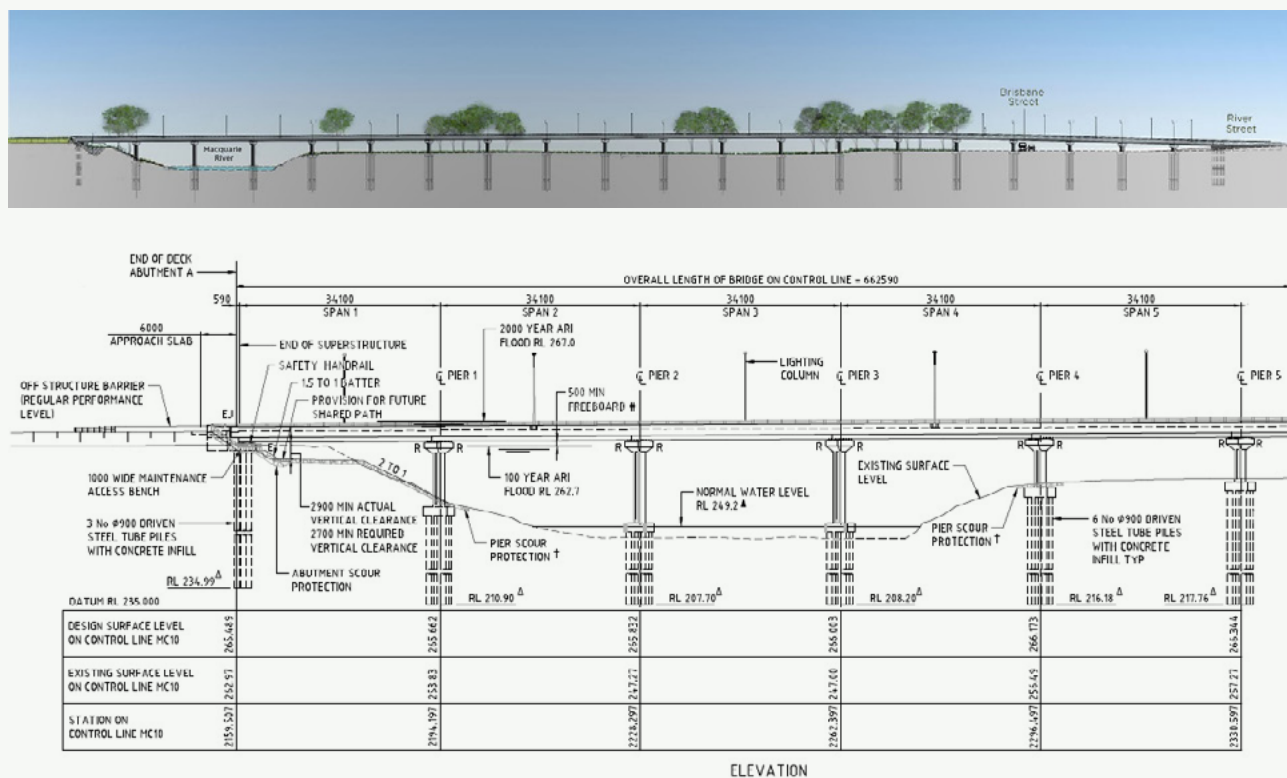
Shows a schematic and a section of drawing indicating the locations of steel piles in the bridge.
